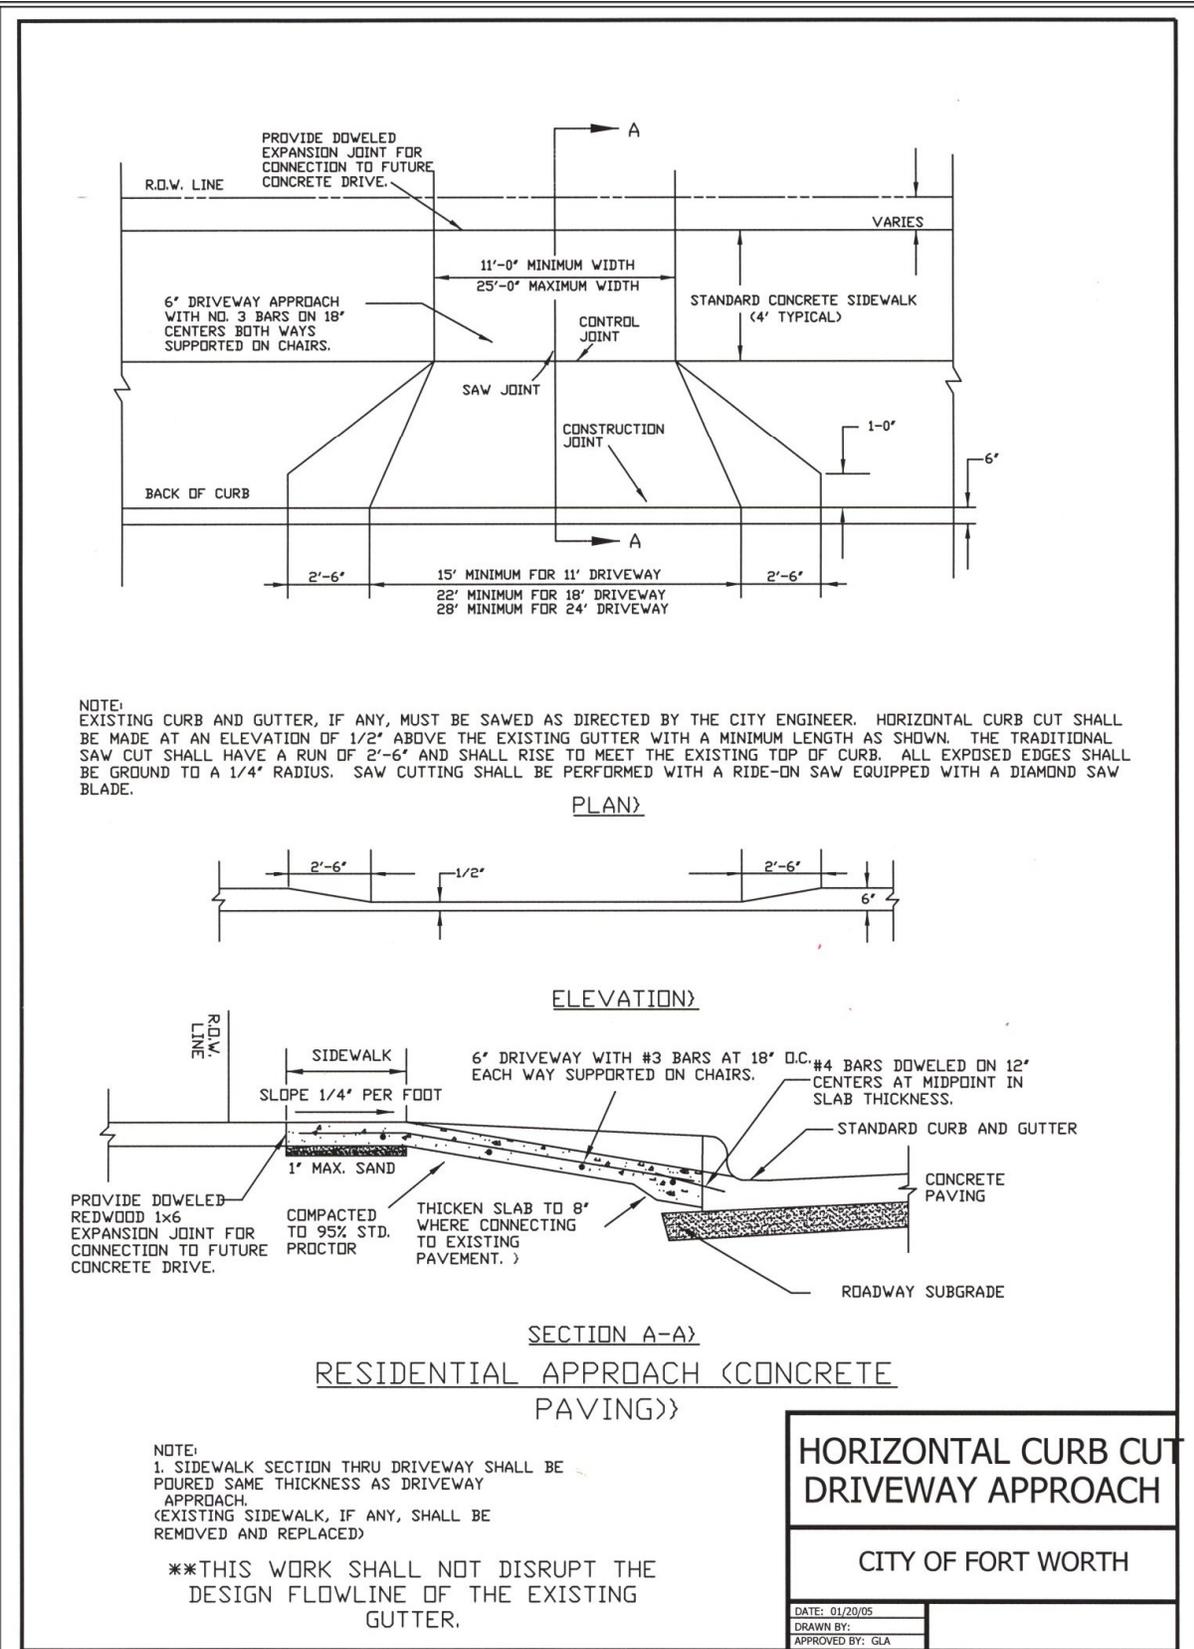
HORIZONTAL CURB CUT DETAIL
